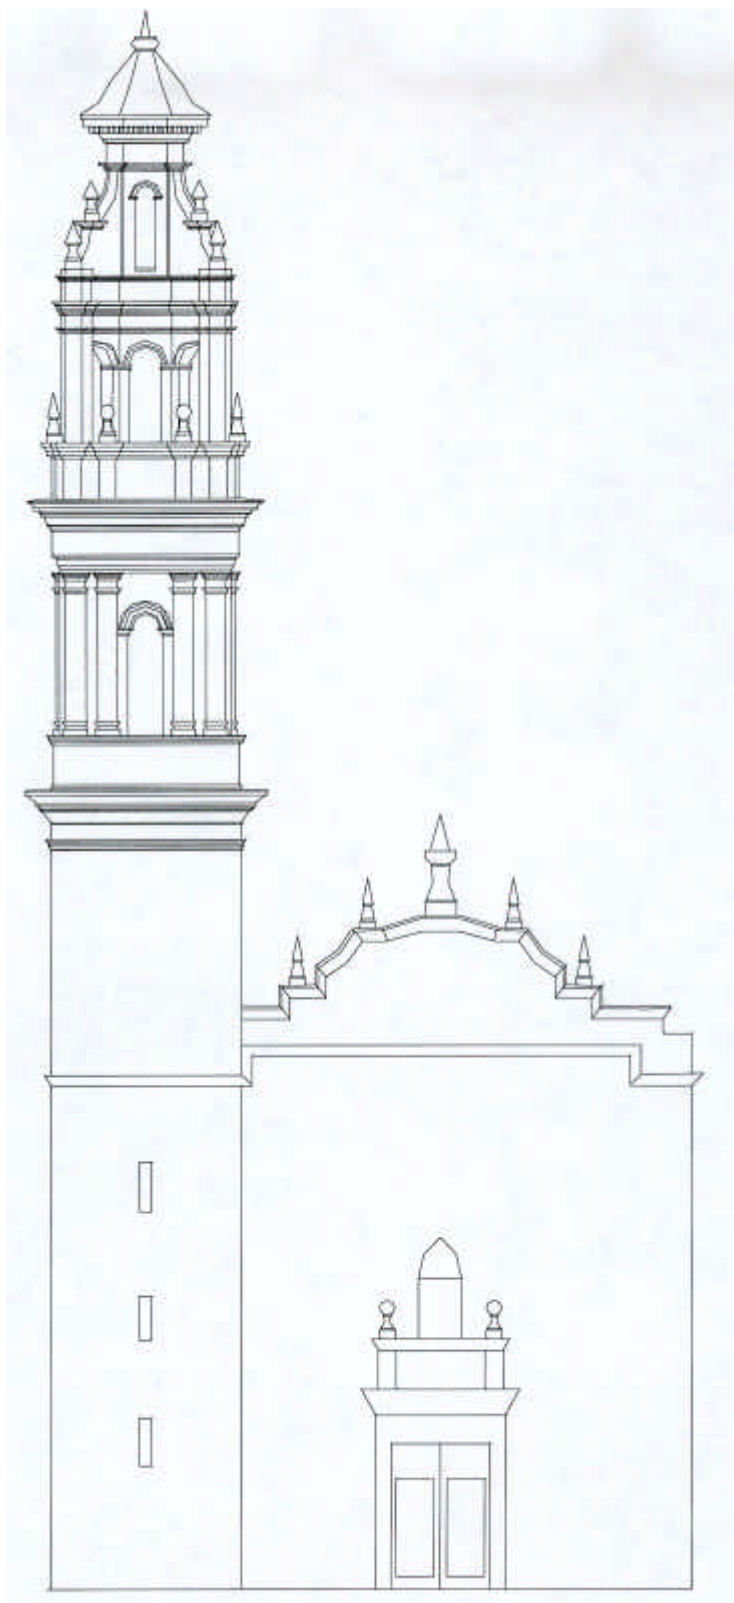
Main facade of the Ntra Sra. del Pilar Church
